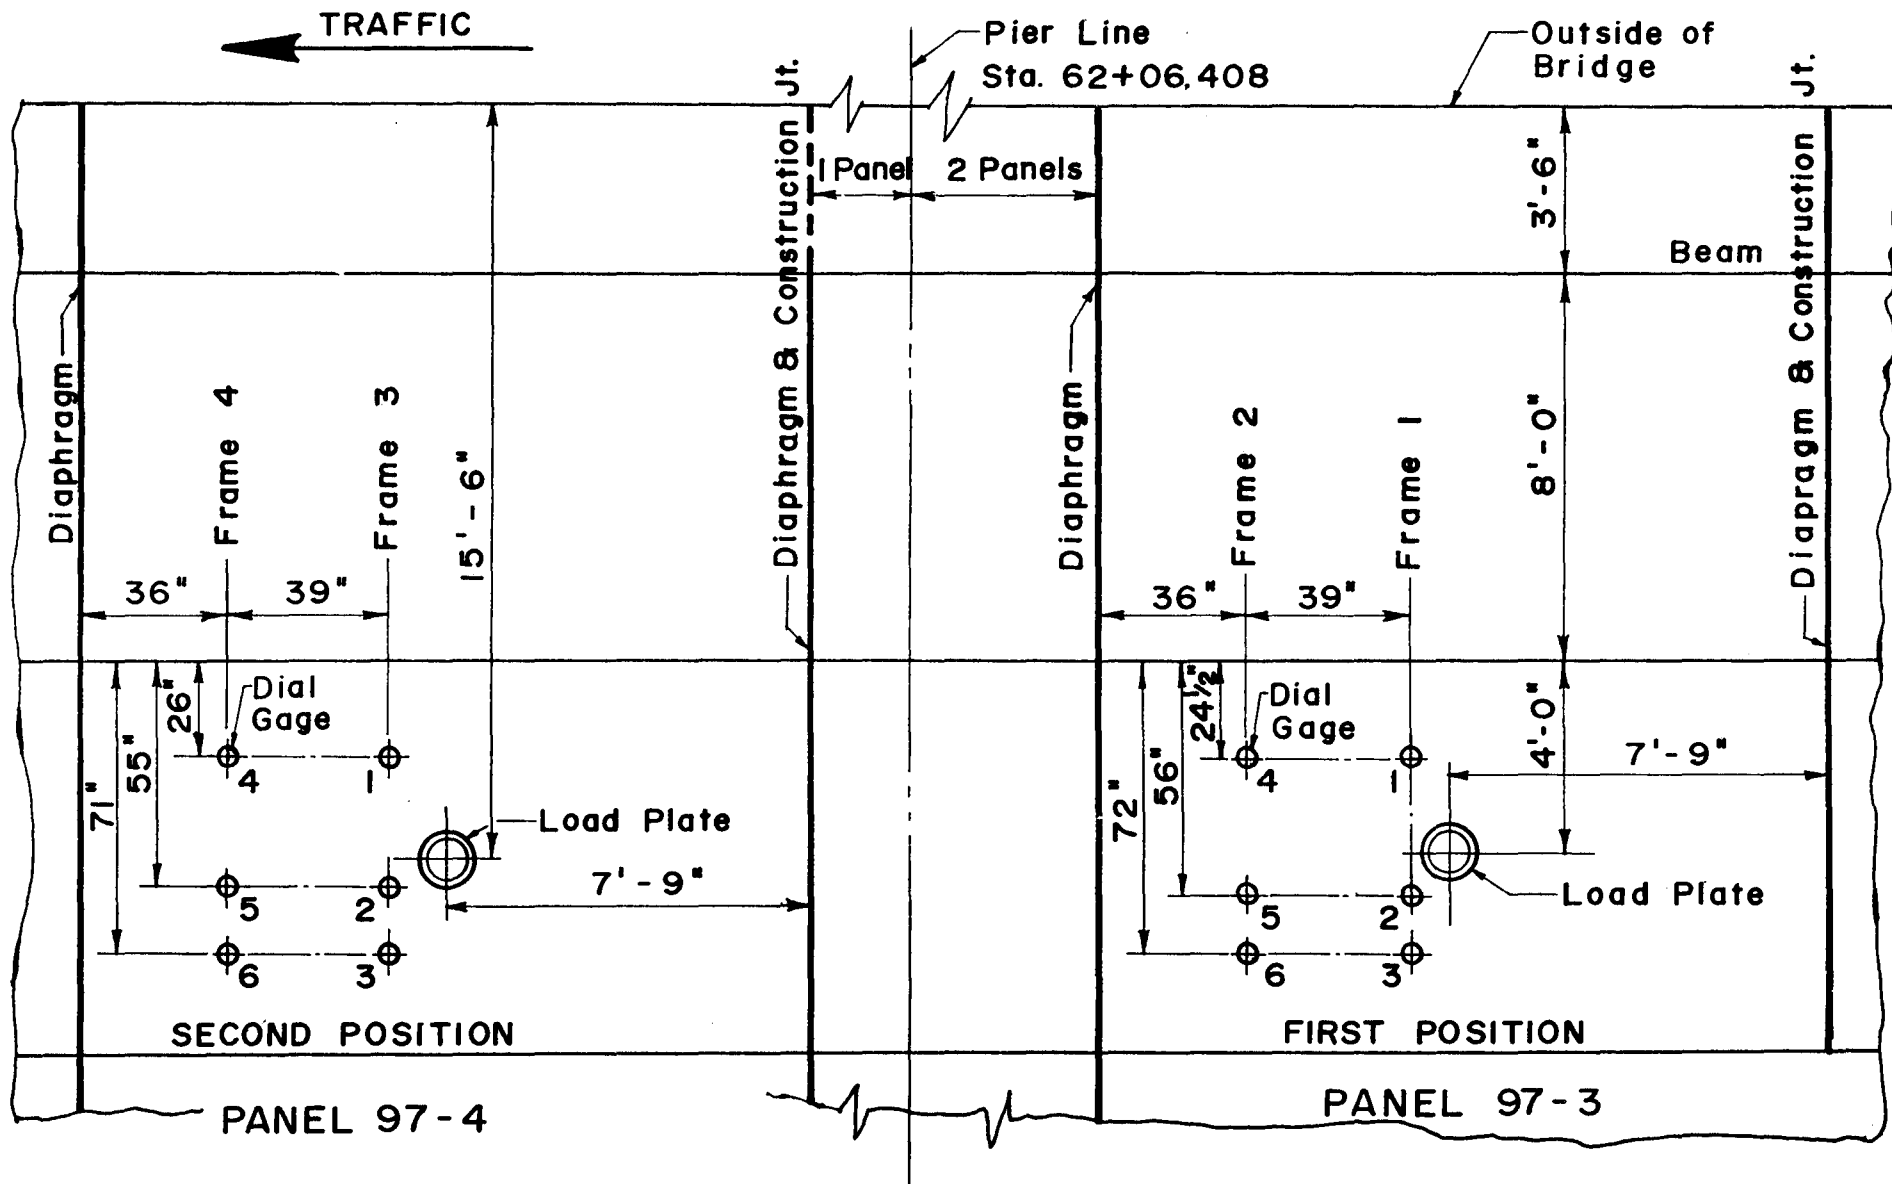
POSITIONS OF DIAL GAGES AND LOAD PLATE - STRUCTURE 97.
